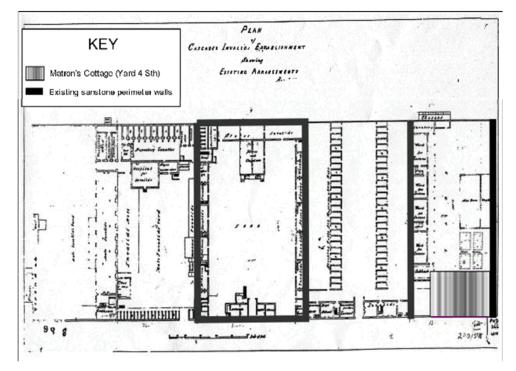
C.1876 survey plan of the Cascades Female Factory with surviving above ground fabric highlighted.
